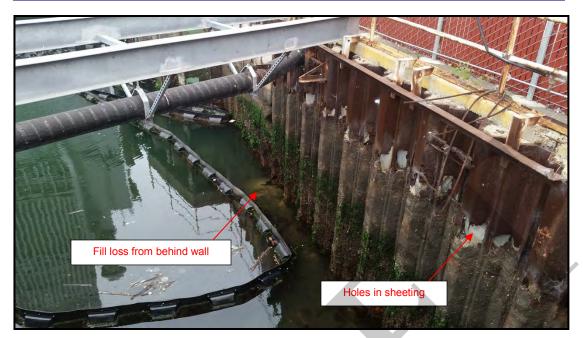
Original steel sheet pile wall at south side of Pier 1.
